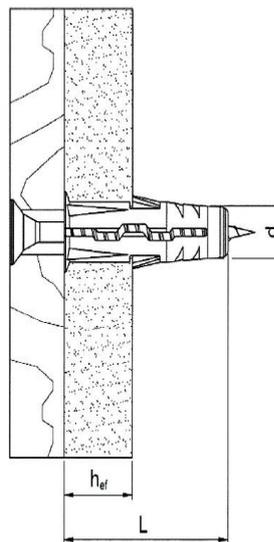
Parameters for installation and arrangement of UNO and UNO TIMBER expansion anchors in gypsum plasterboard substrates
